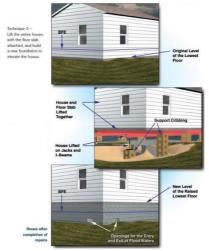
Techniques for elevating floor levels (FEMA, 2000)
